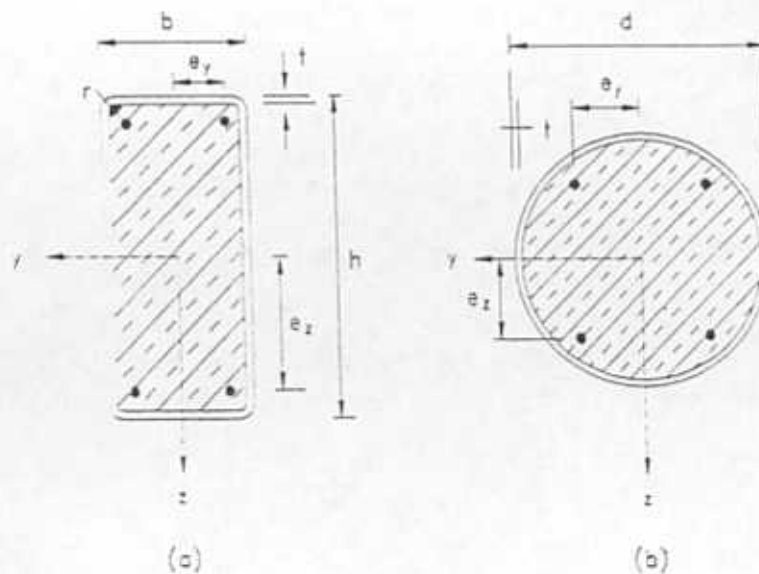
Concrete Filled Circular and Rectangular Hollow Sections with Notation
